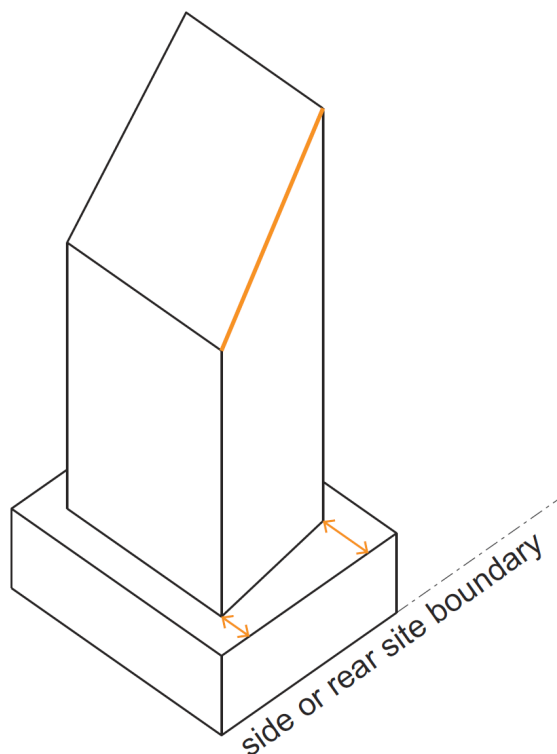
Side and Rear Setbacks vary in plan as the height of the top of building varies.
